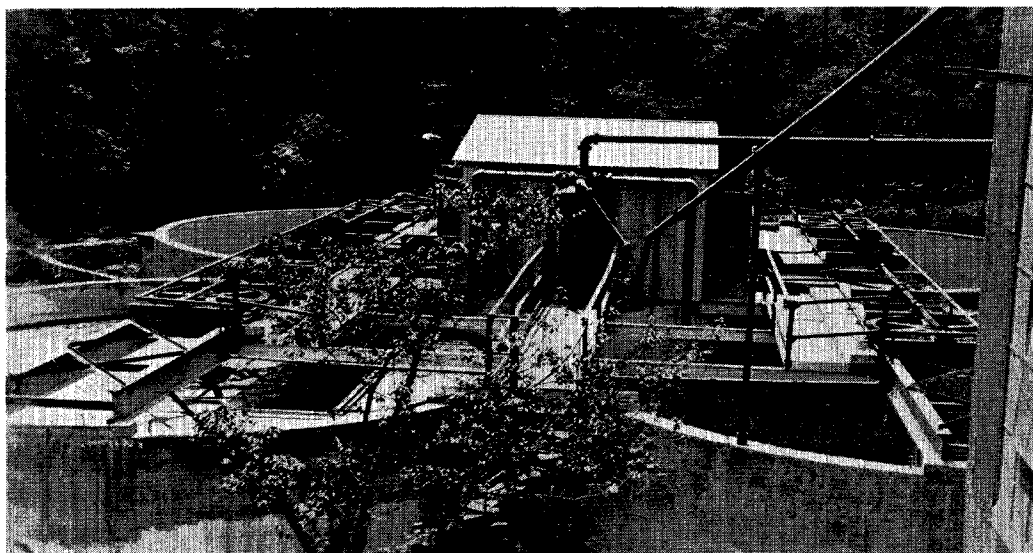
SLURRY MIXERS IN A CEMENT PLANT
